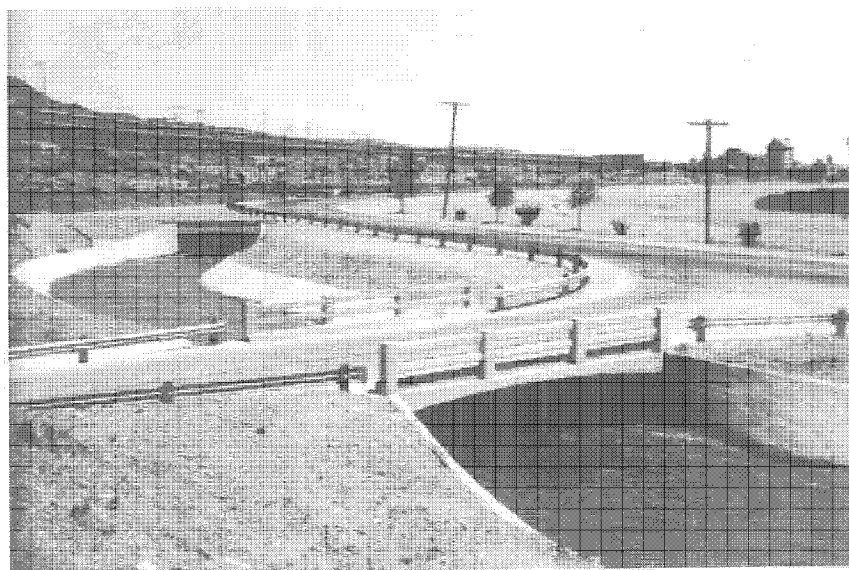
View of the Smelter Bridge and American Canal, looking south, June 11, 1938.
